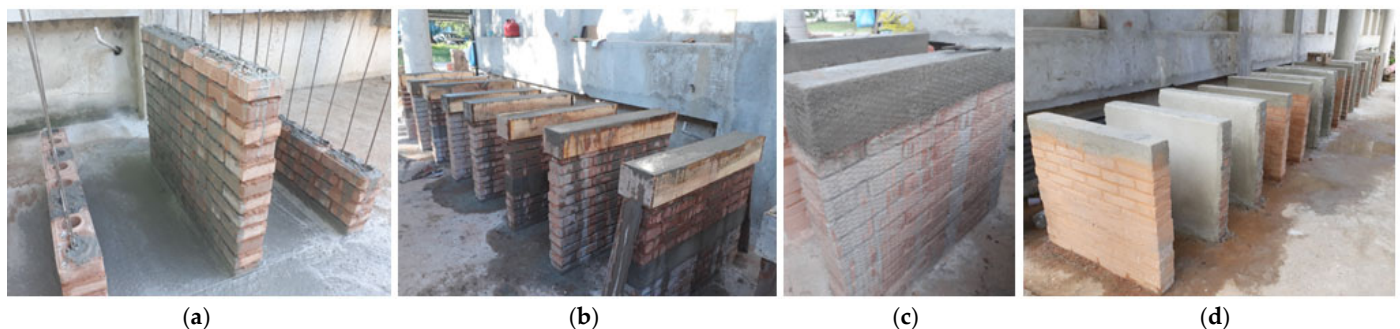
(a,b) Wallet construction; (c) details of wallets evolved in metallic mesh, ready to be plastered; (d) wallets ready for tests.
